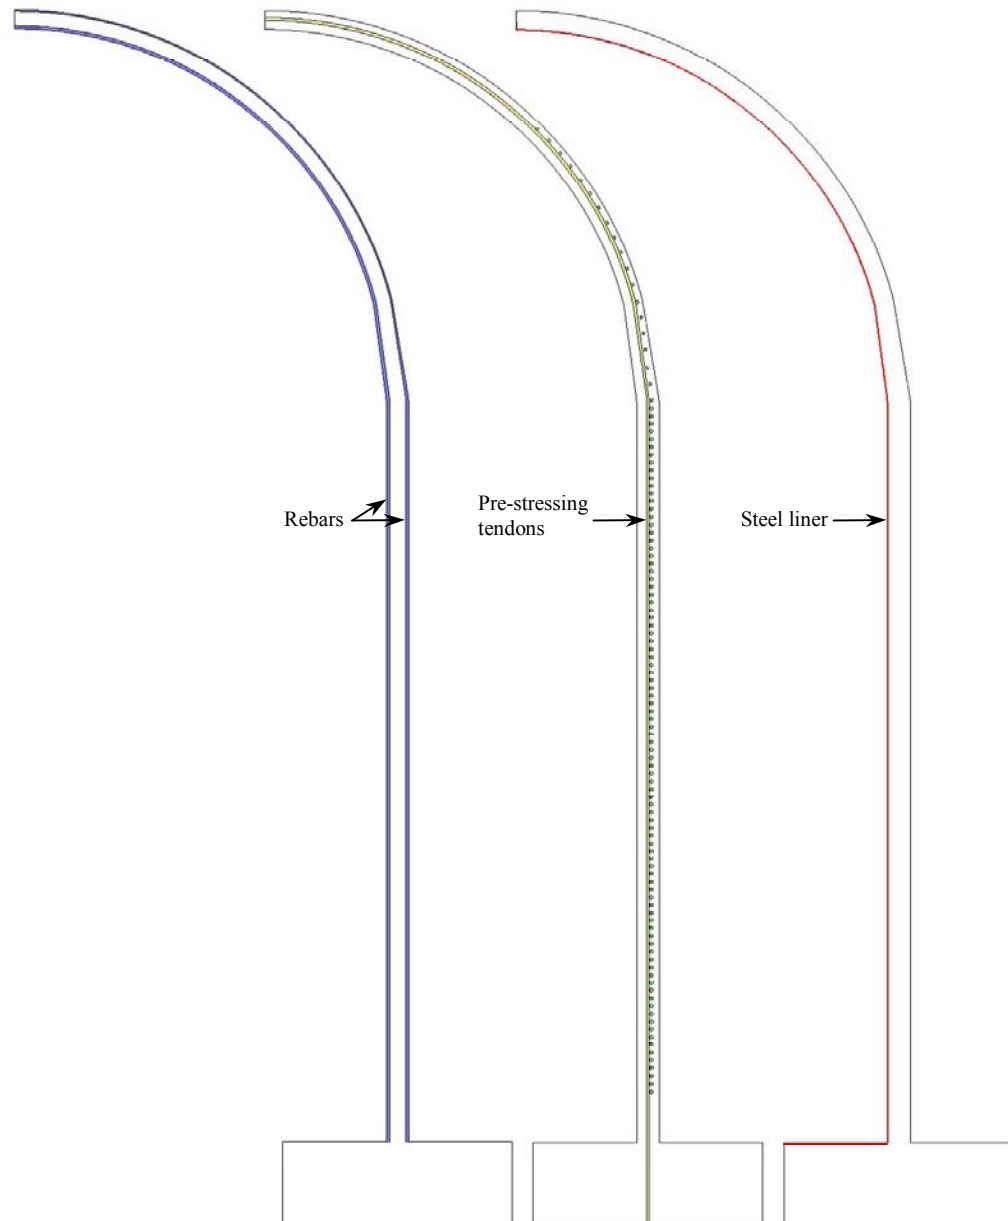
Positions of rebar, pre-stressing tendons and steel liner.
